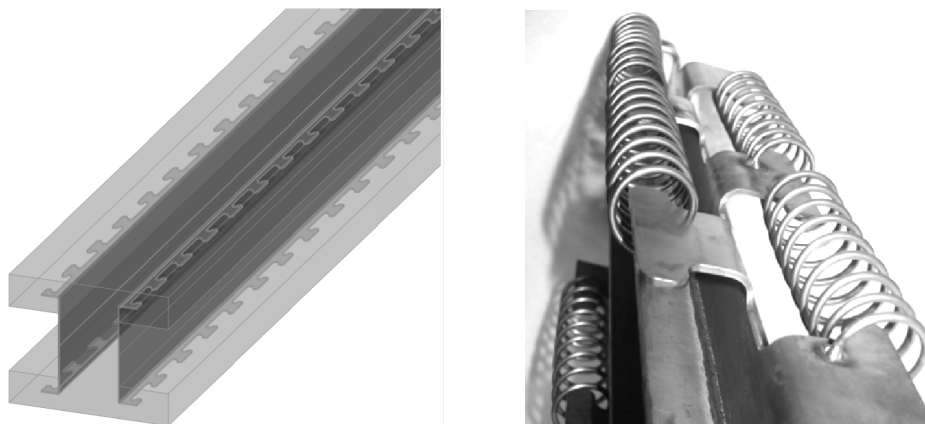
Example of a possible application (left) and spiral reinforcement (right).
